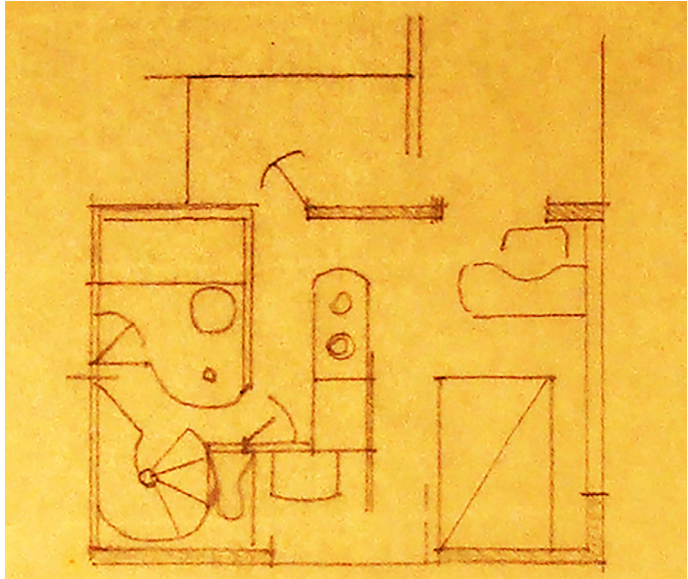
Eileen Gray. Project for a *Two-storey house*, 1942. First floor plan. Bedroom and bathroom. Detail. London, V&A Museum.
